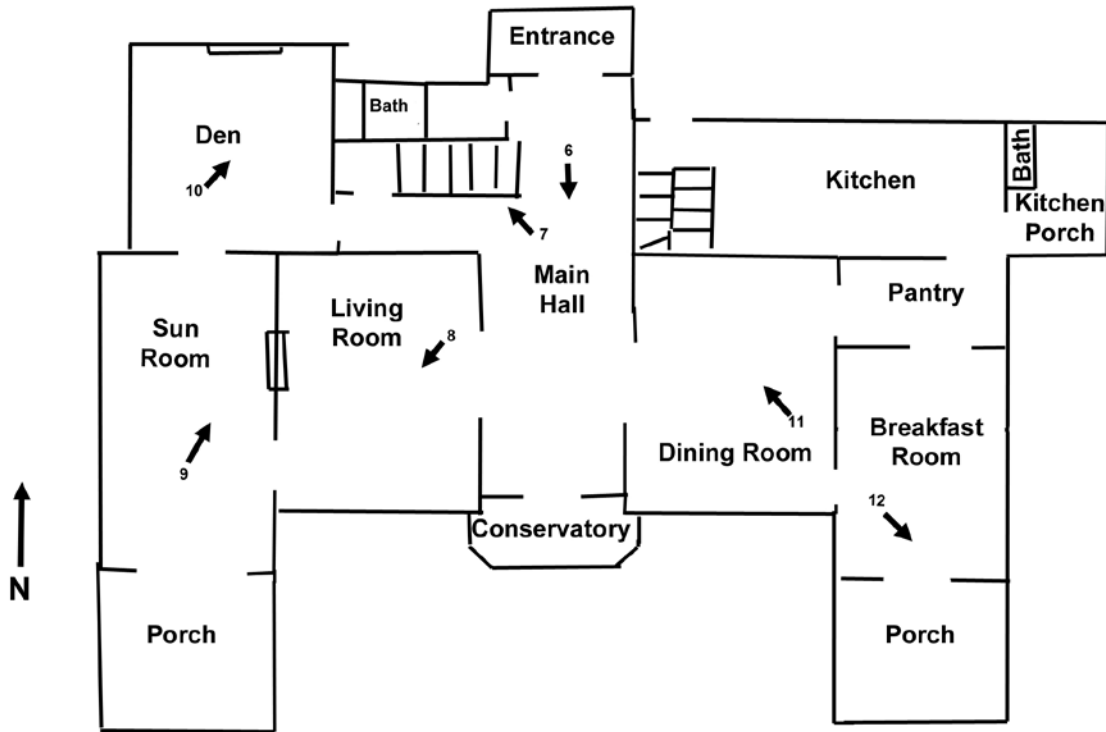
First story floor plan, not to scale, with photo locations. (Susan Jezak Ford)
